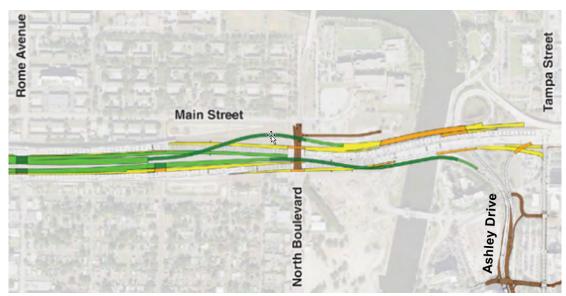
Improvements Rome Avenue to Ashley Drive/Tampa Street
